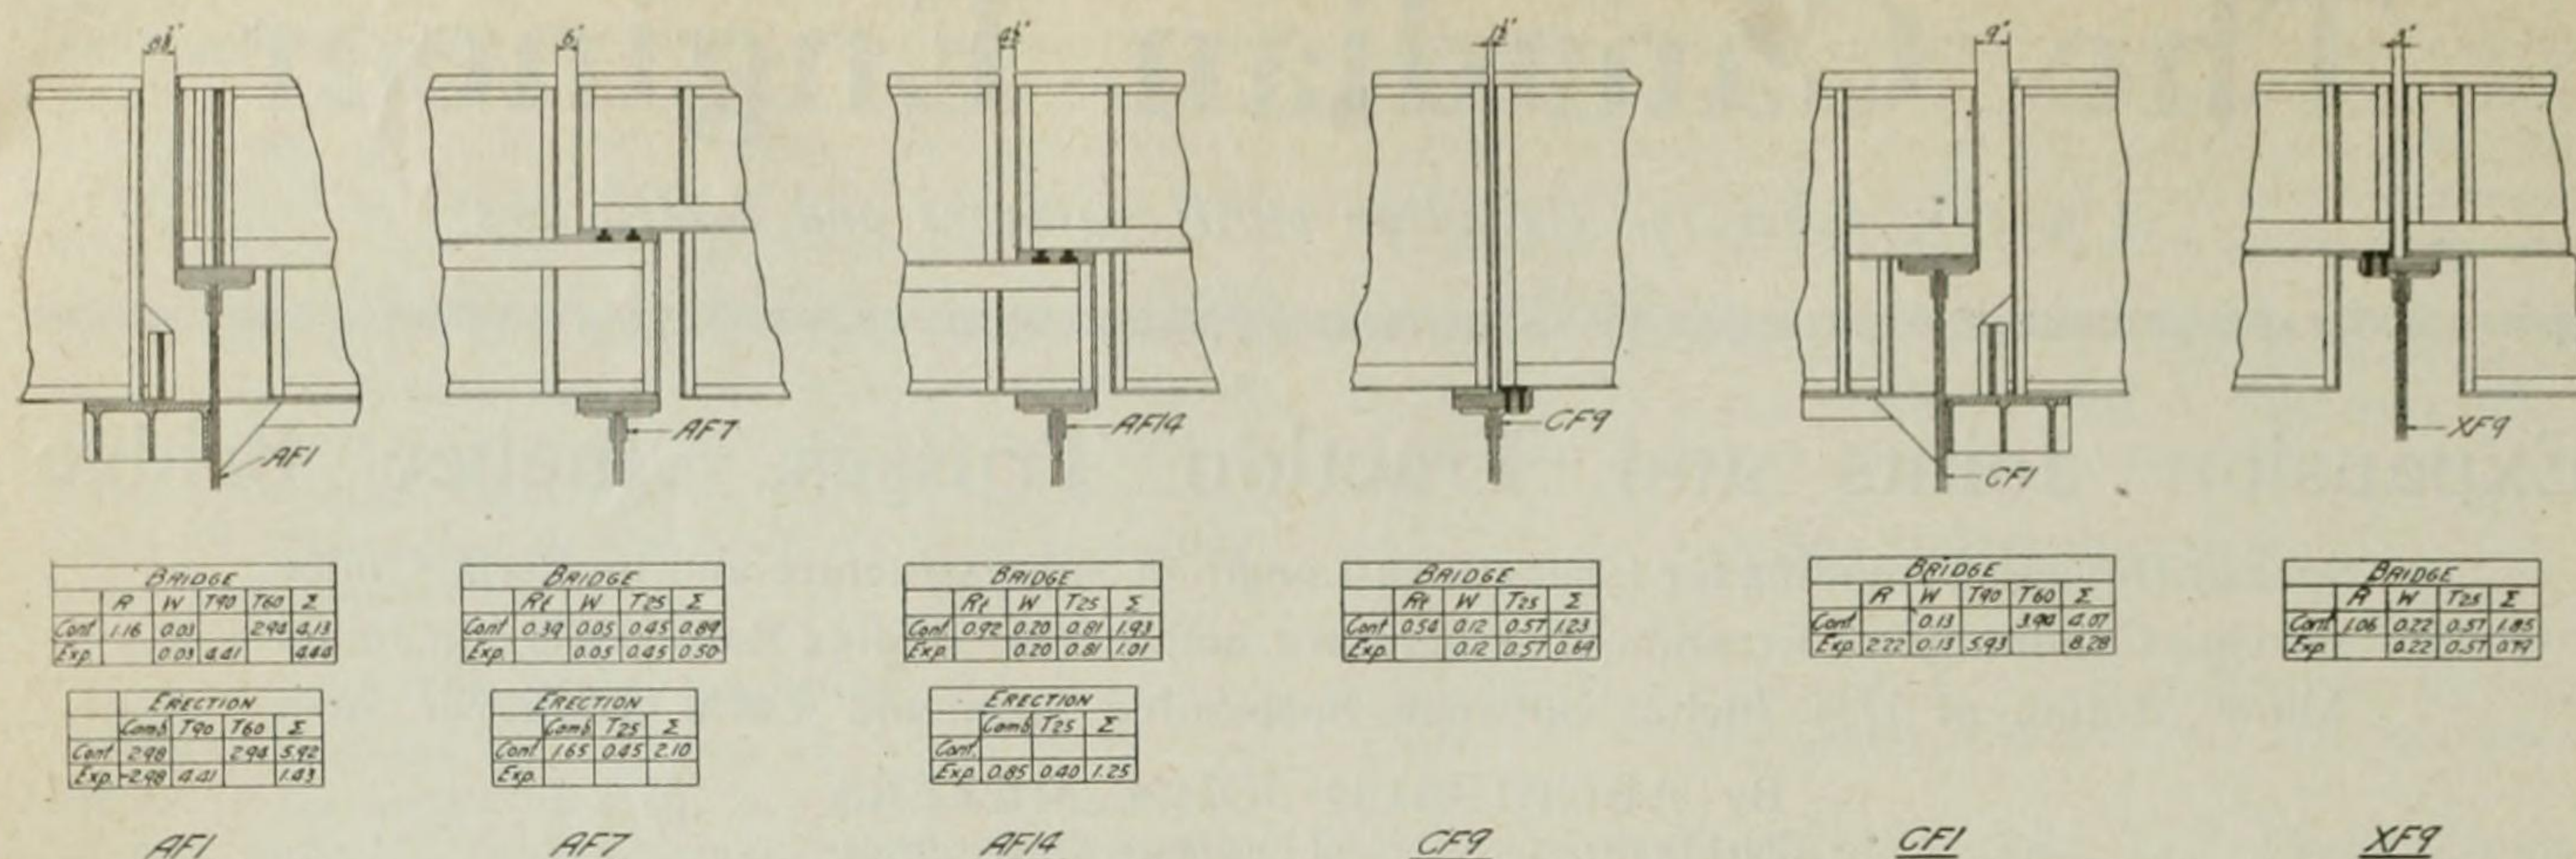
Expansion Joints for Track Girders at Main and Intermediate Panel Points
